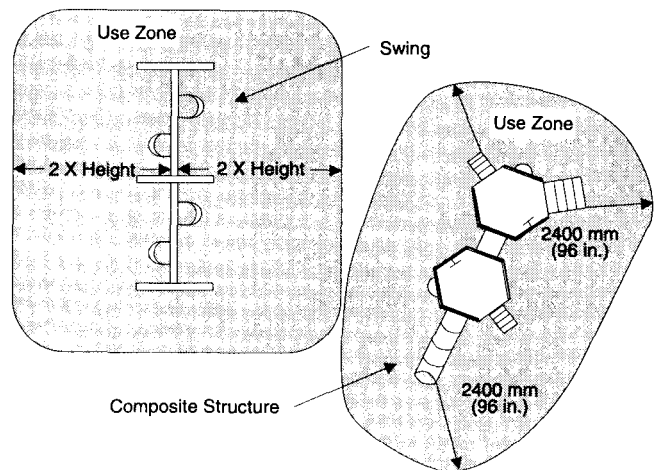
Adjacent Play Equipment without Overlapping Use Zones.
